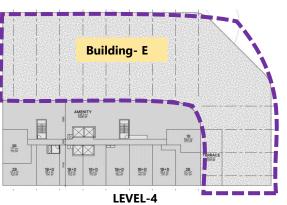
Floor plans RWDI Project #2200433 April 18, 2022
